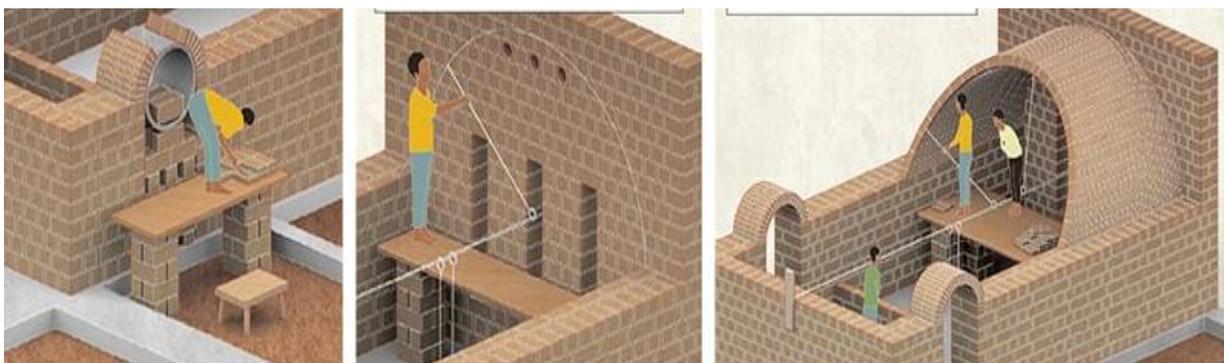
shows the Nubian vaults roofing structure in as a modern solution for rural Tanzania
